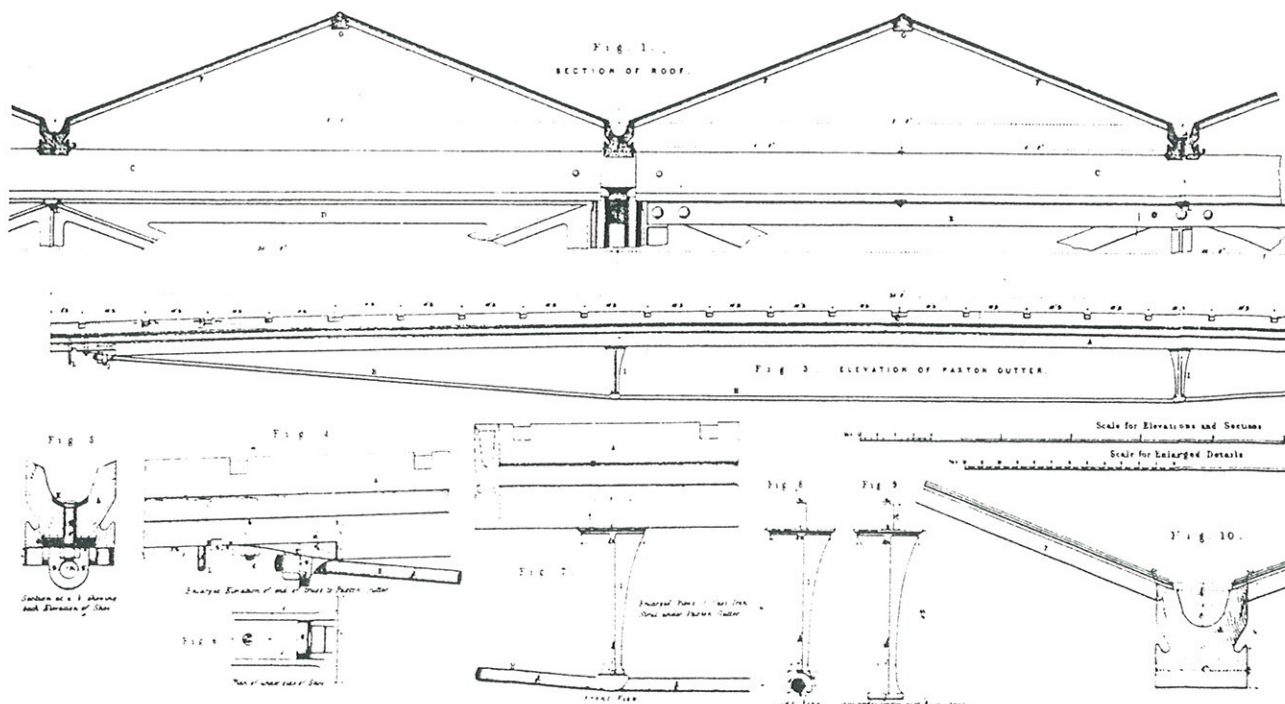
Paxton gutter and associated glazing as used in the Exhibition Building and possibly for the original roof covering at Oxford
